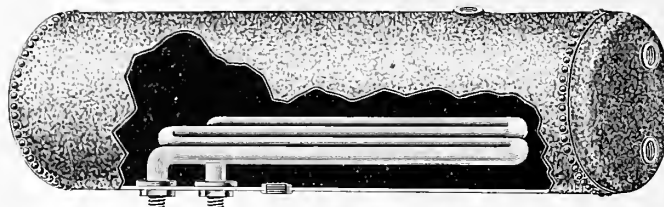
GALVANIZED IRON HORIZONTAL BOILER, WITH COIL, BOTTOM CONNECTIONS.
